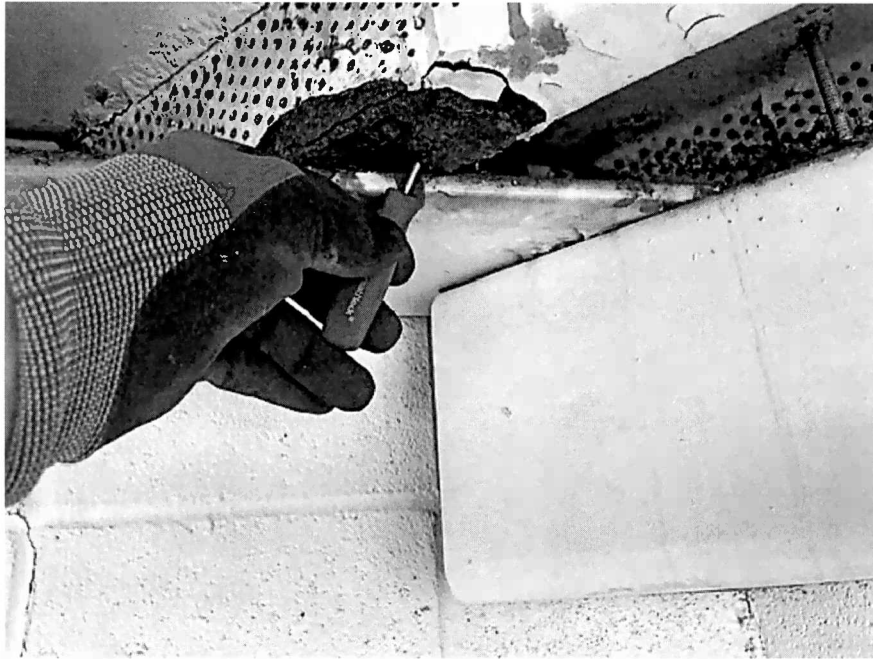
Severely damaged roof deck bearing at north-west wall
